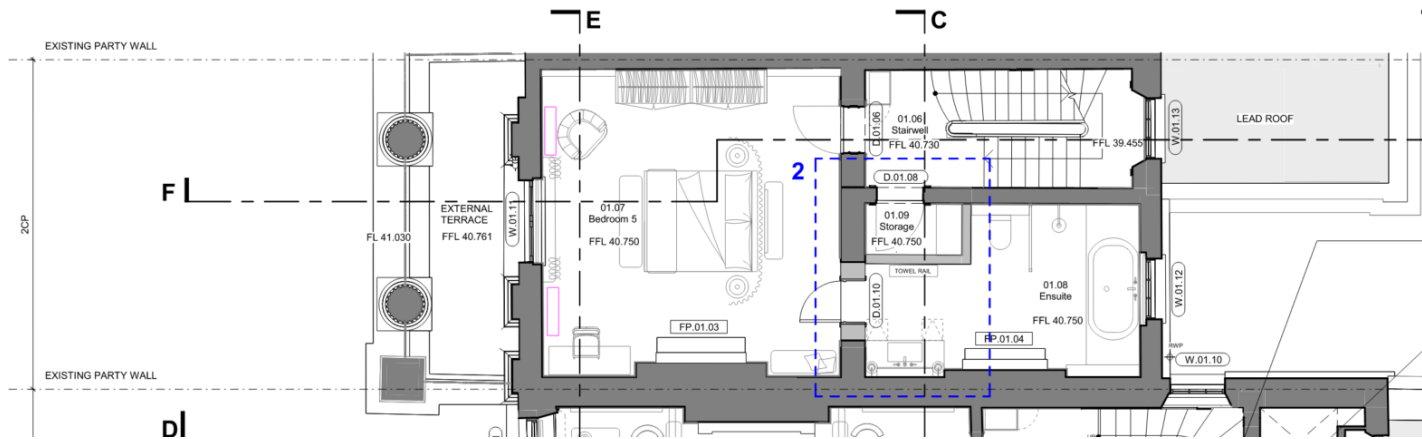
Extract from proposed 1<sup>st</sup> floor plan (above) showing new cupboard
